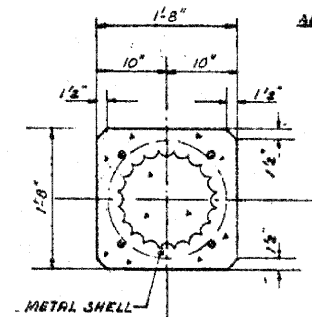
DETAIL OF SPIRALLY WELDED STEEL SHELL
